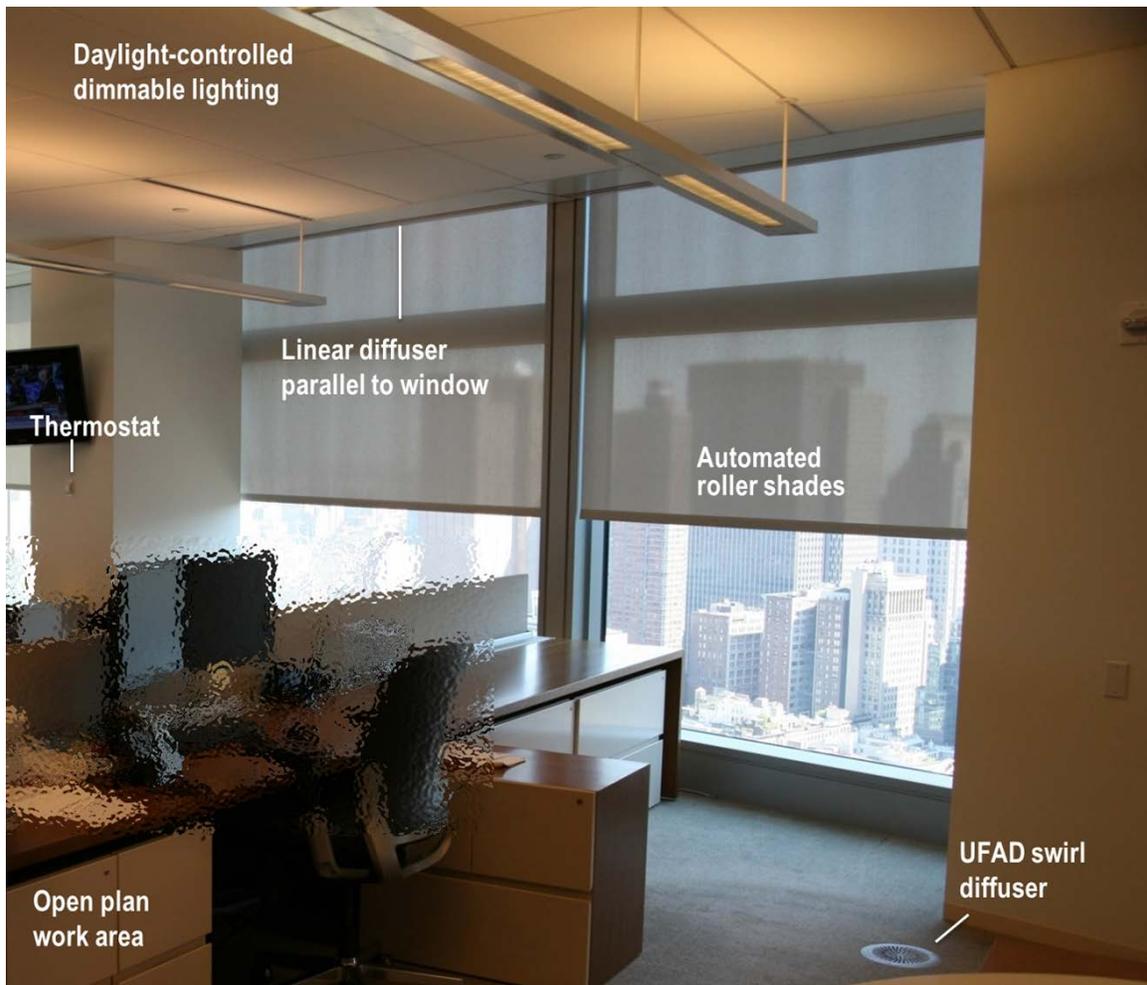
Photograph showing the lighting and window conditions in the open plan area on the reference floor.
